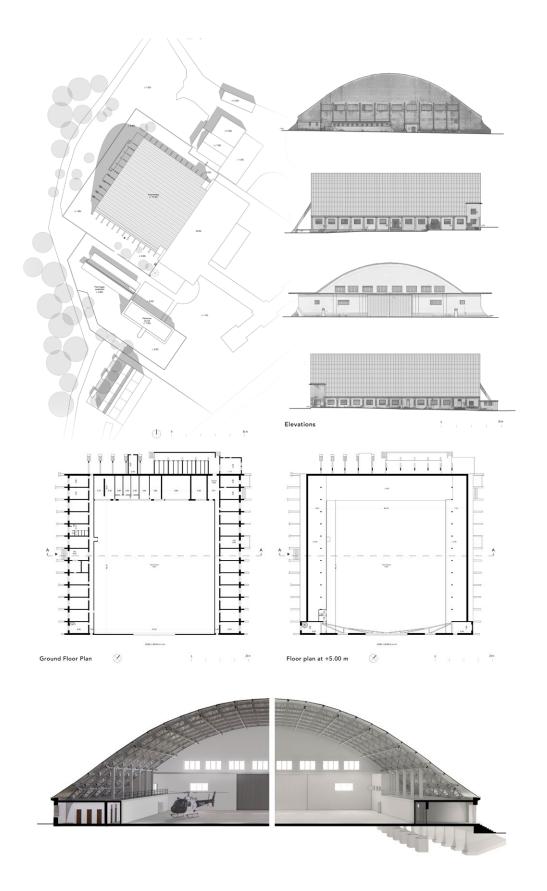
| Architectural survey campaign and graphic representation of plans, elevations, and urban layout. Source: By the authors.
